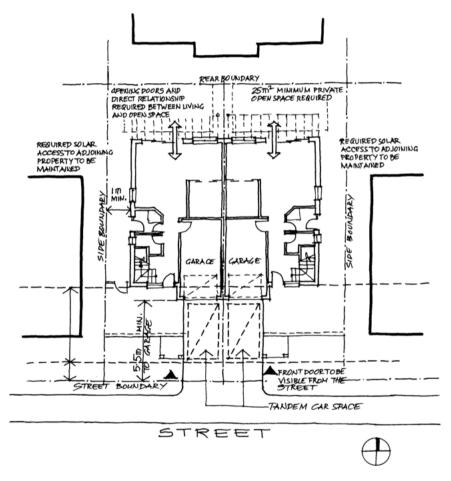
Town house layout (south to the street).
